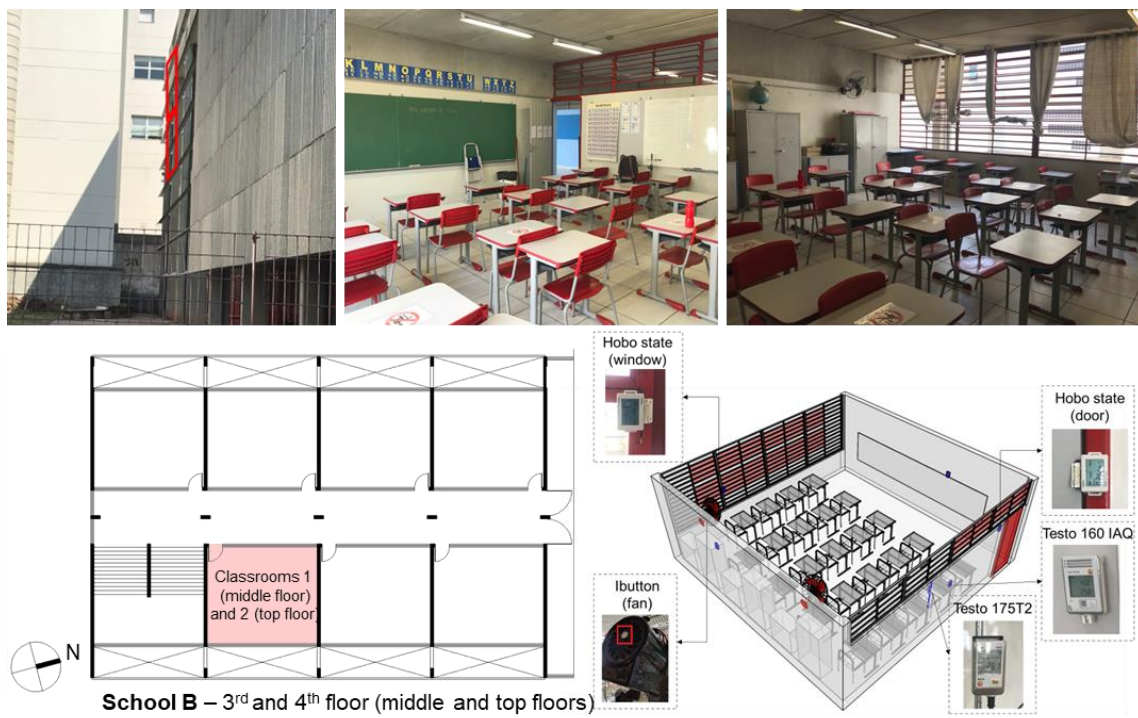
Pictures of the school and the monitored classroom, floor plan and classroom perspective (School B).
